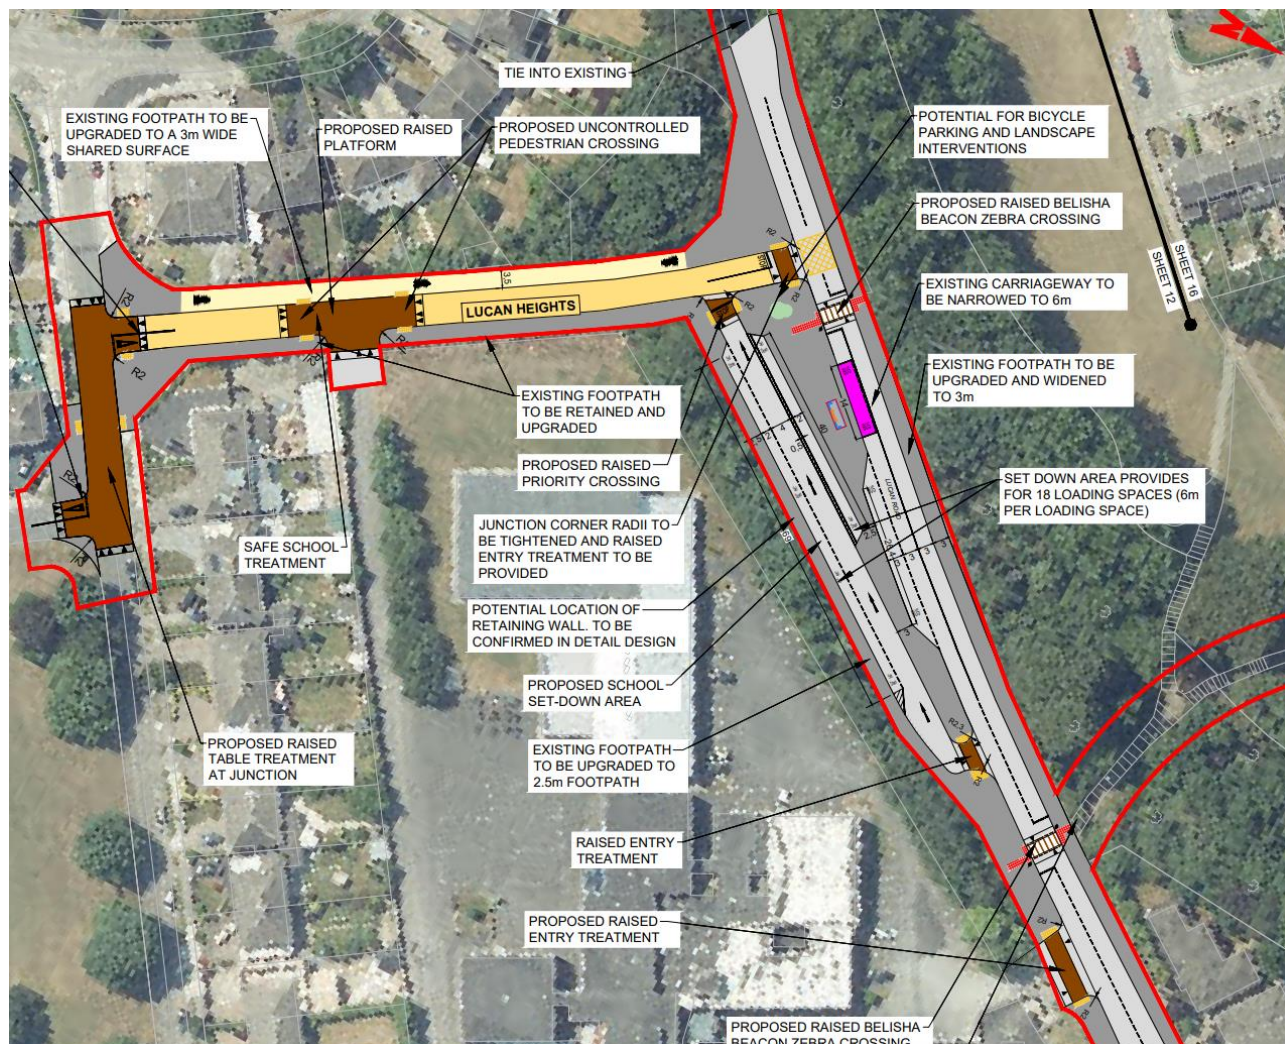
Proposed General Arrangement Outside St. Joseph's College
